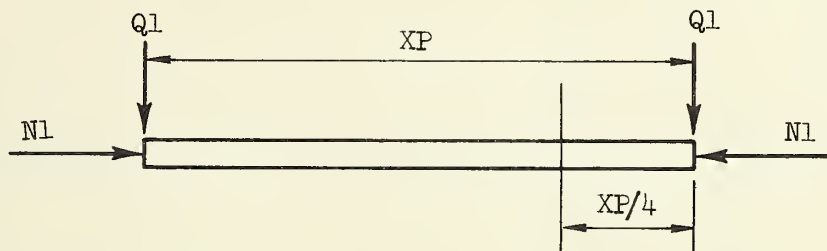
Pavement design for LC#1,  $Q1 > 0$ .
